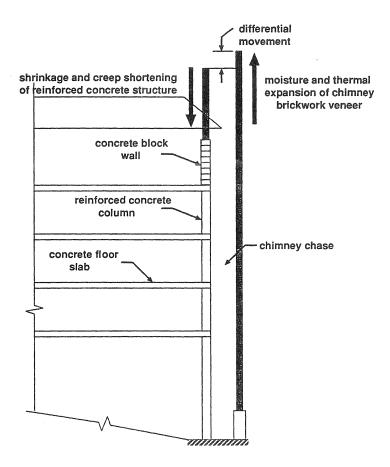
Schematic view of different veneer heights and support conditions of front and back parts of chimney indicating need for a movement joint. Cracking distress occurred towards top of chimney.
